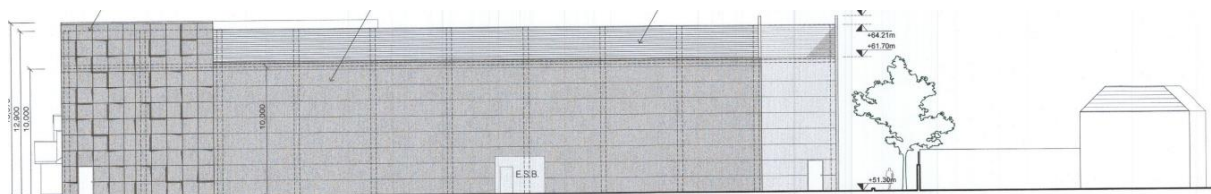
Extract of proposed west elevation of warehouse which is significantly taller than surrounding dwellings.
